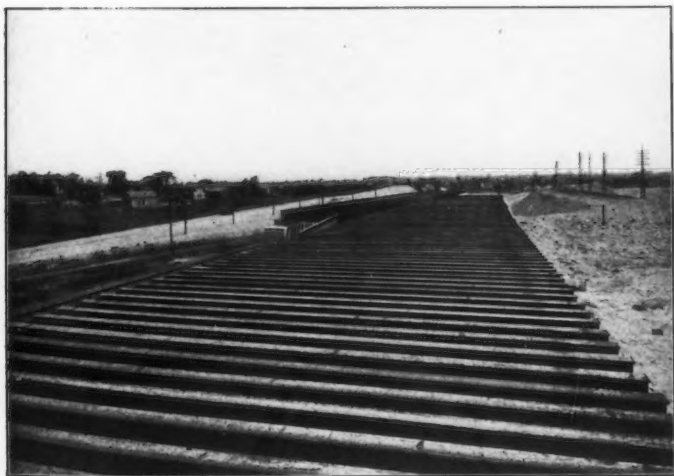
VIEW OF BRIDGE NO. 2 BEFORE PLACING CONCRETE FLOOR.
